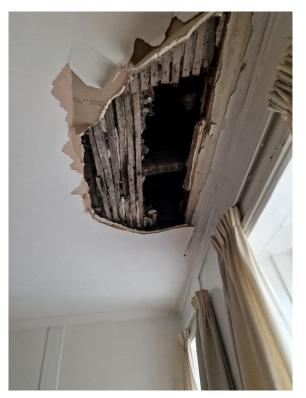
Caved-in Ceiling at 45 Great Ormond Street
